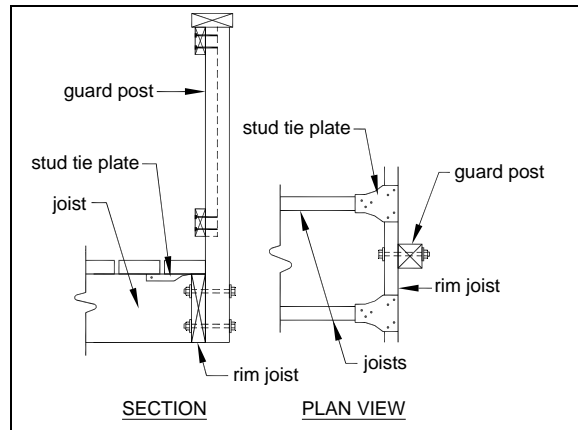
GUARD POST TO RIM JOIST DETAIL, OPTION 3
